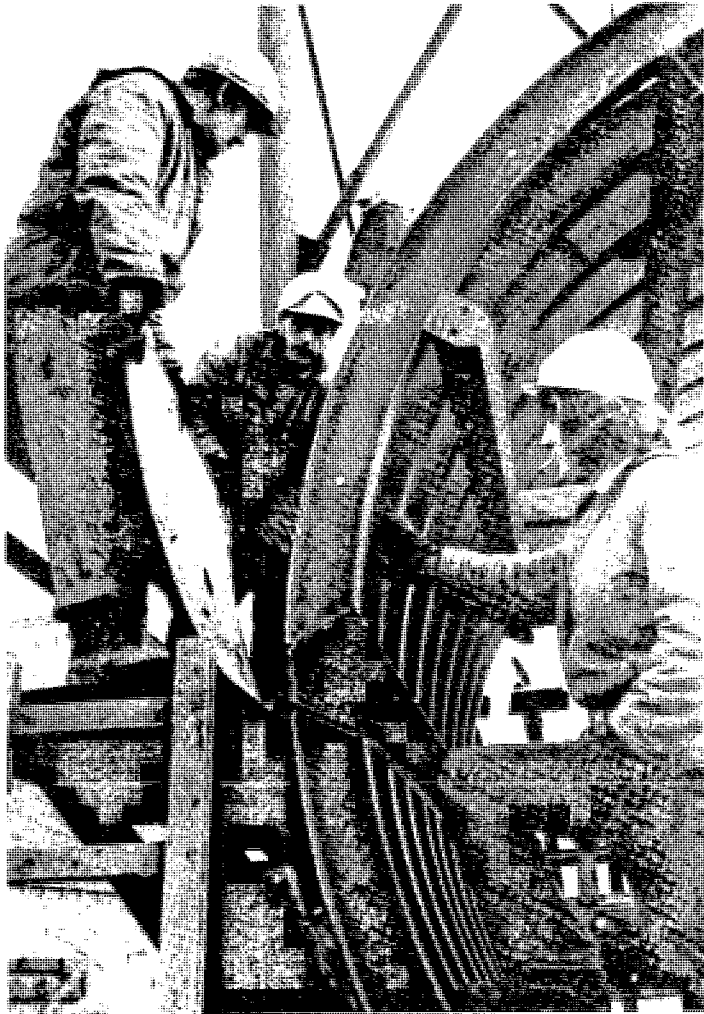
Placing of resin concrete segments on steel shuttering cages.
